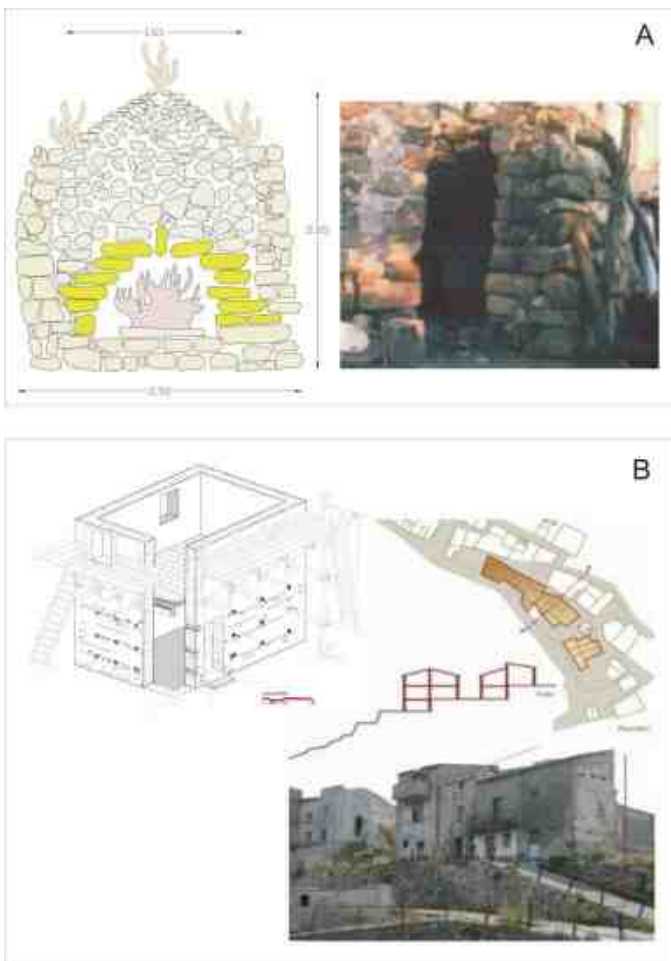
Carcamusa* ancient brickwork oven used to cook gypsum (A); example of building character of the Benestare village (B).
